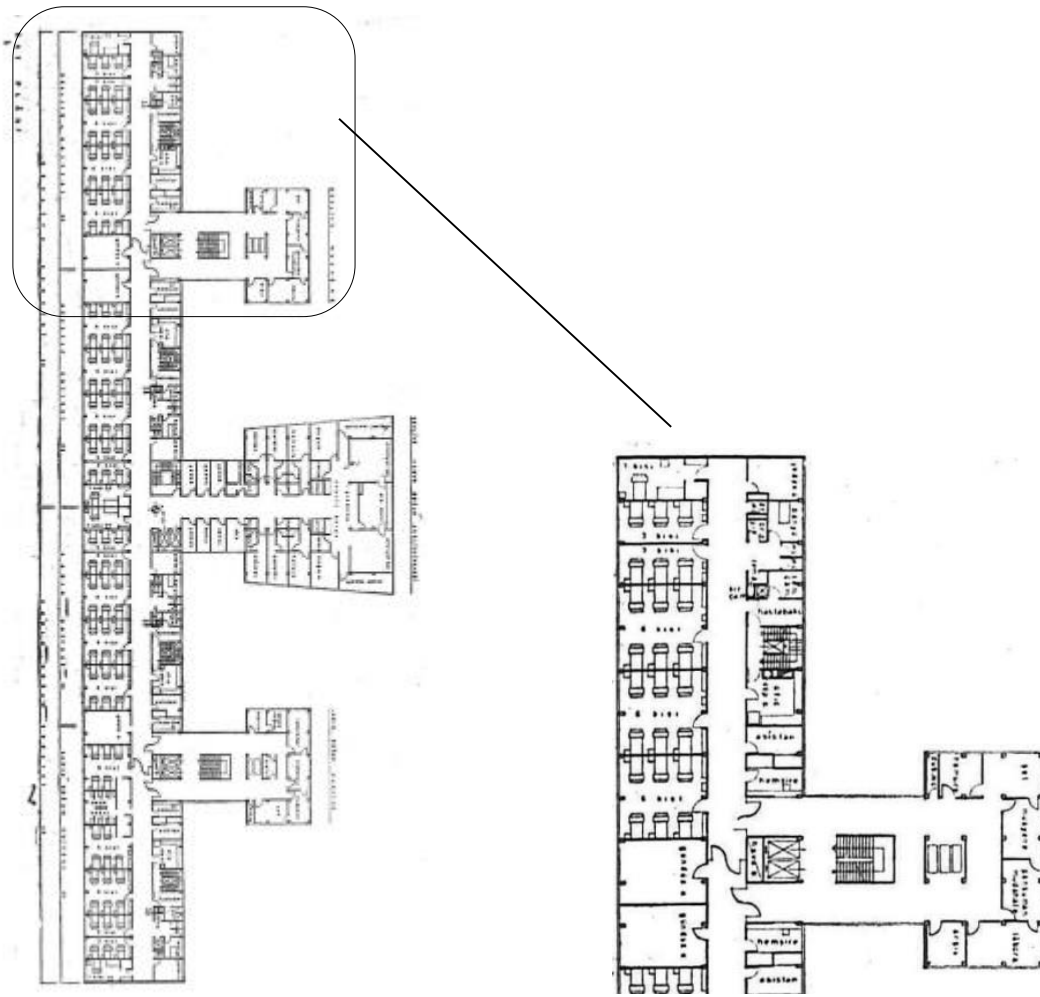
Floor Plans and Inpatient Rooms, Vakıf Guraba Hospital
